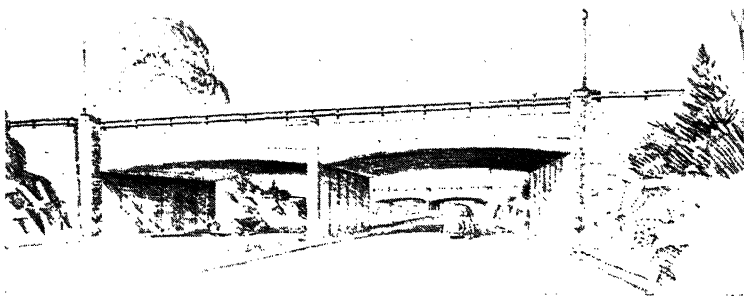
Sketch of two-span rigid-frame bridge, New Jersey approach to the Lincoln Tunnel, Union City, N. J.
